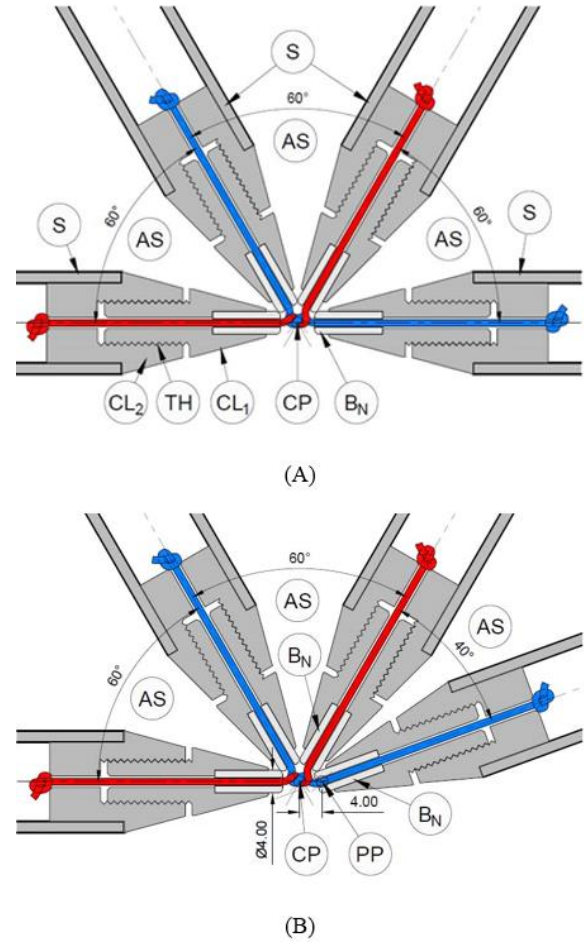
Cross-section of tapering cord joint. (A) aligned strut, (B) pivoting strut.
